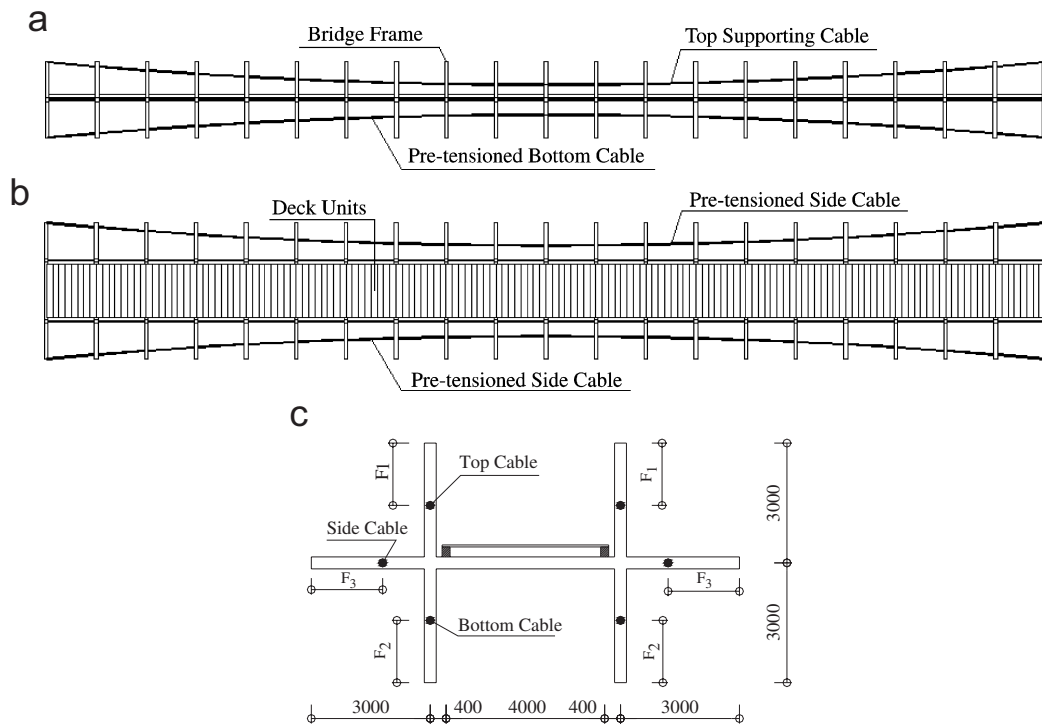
Suspension footbridge model with reverse profiled cables: (a) elevation; (b) top view; (c) middle transverse bridge frame.
